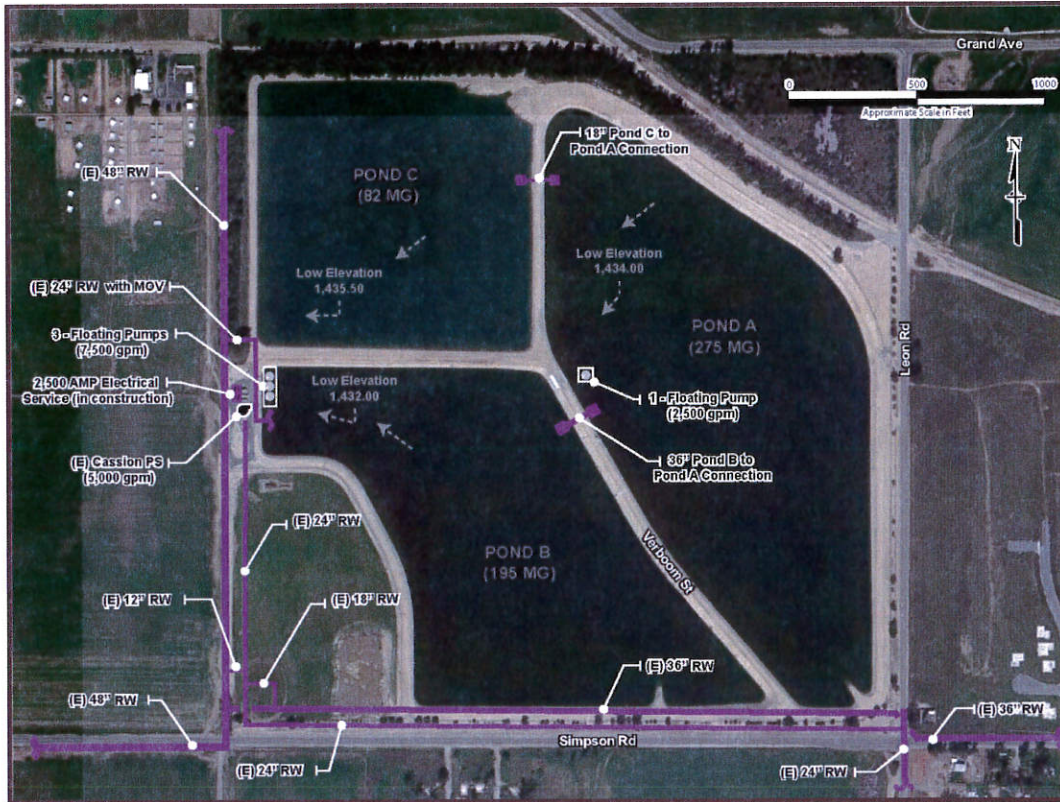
Existing Facilities at Winchester Recycled Water Storage Ponds
